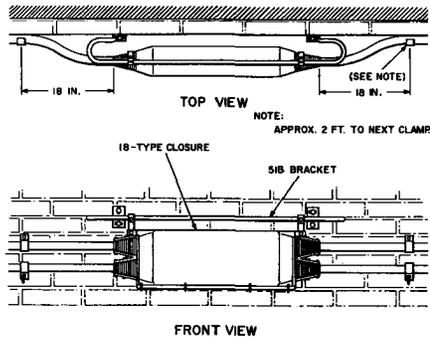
Typical Bracket and 18-Type Closure Mounting
